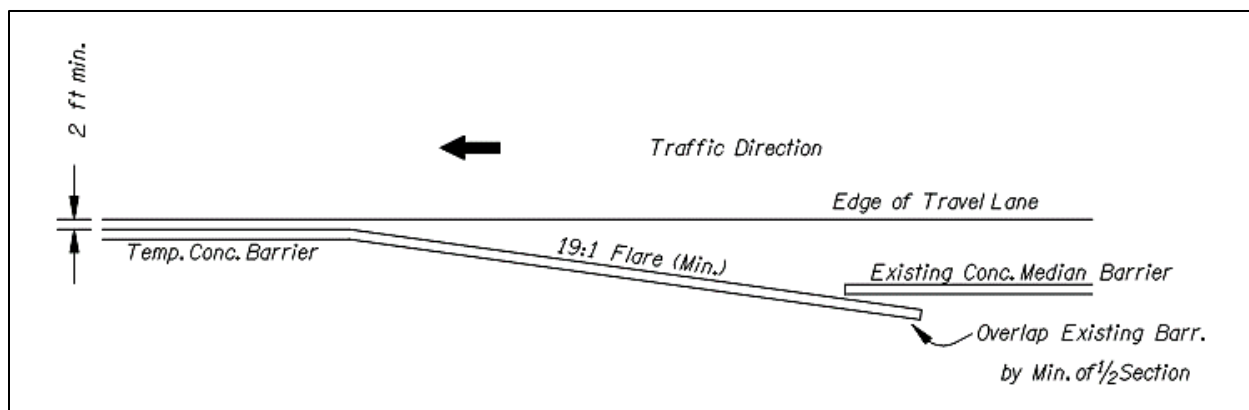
Typical Overlap of Temporary Concrete Barrier
